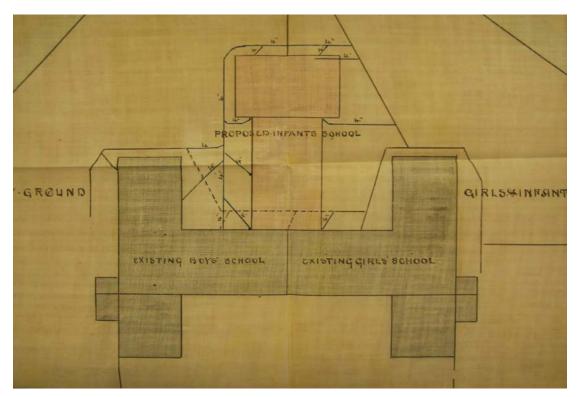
Proposed plan of infants department from 1886 (CRO(B) WSUD/U/574 1886)
